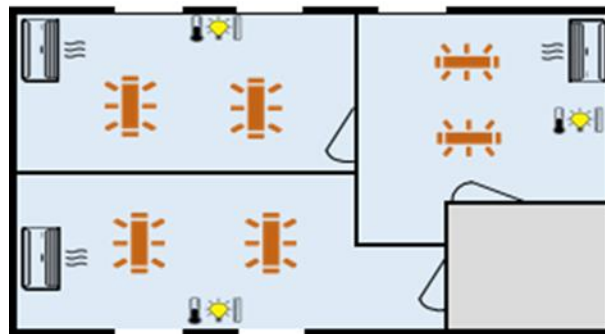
Building plan of zone 1 evidencing the installed sensors equipment
